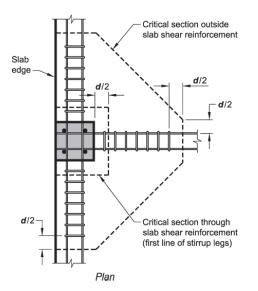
Critical sections for two-way shear in slab with shear reinforcement at edge column.
